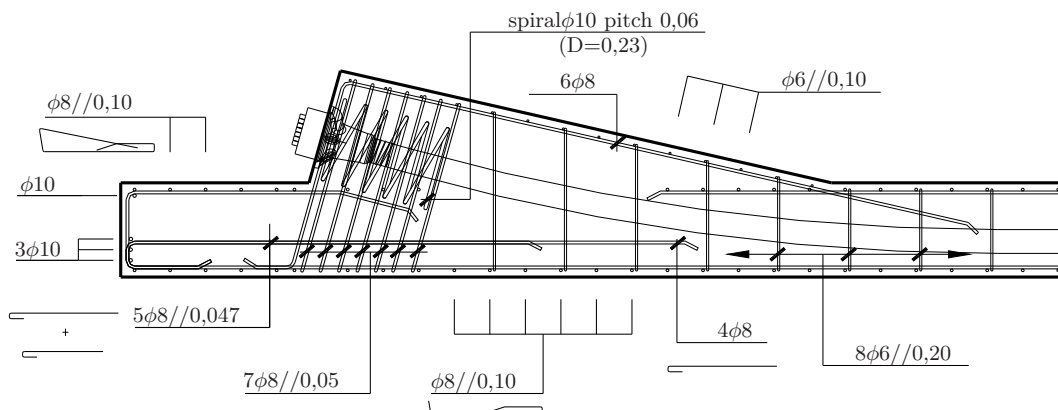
Reinforcement in the blister anchorage zone for tendon A
